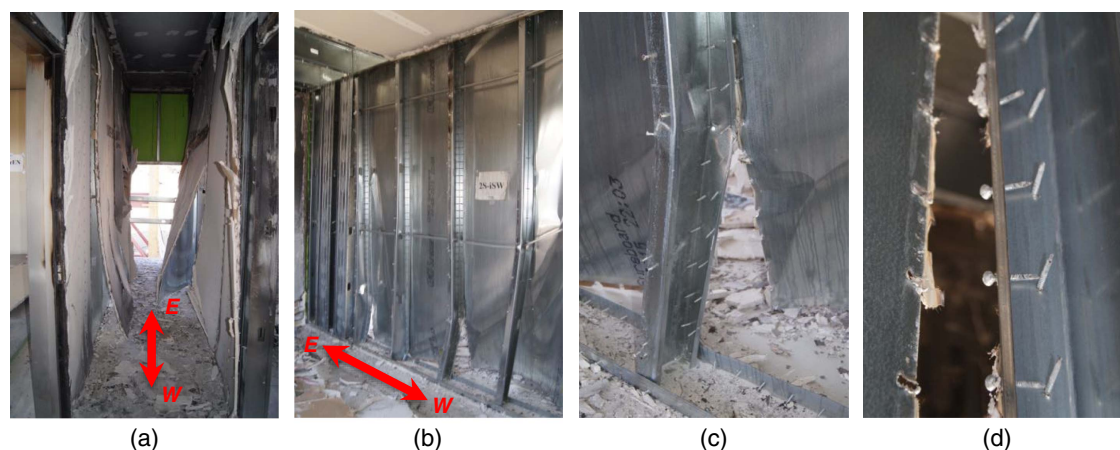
Interior view of the Level 2 corridor shear wall damage at the end of the test program (arrow denotes the direction of shaking): (a) corridor (viewing eastward); (b) southwest room; (c) buckling and bending of framing stud precipitated by loss of sheathing fasteners; and (d) structural panel fastener tearing. (Images by Xiang Wang.)
